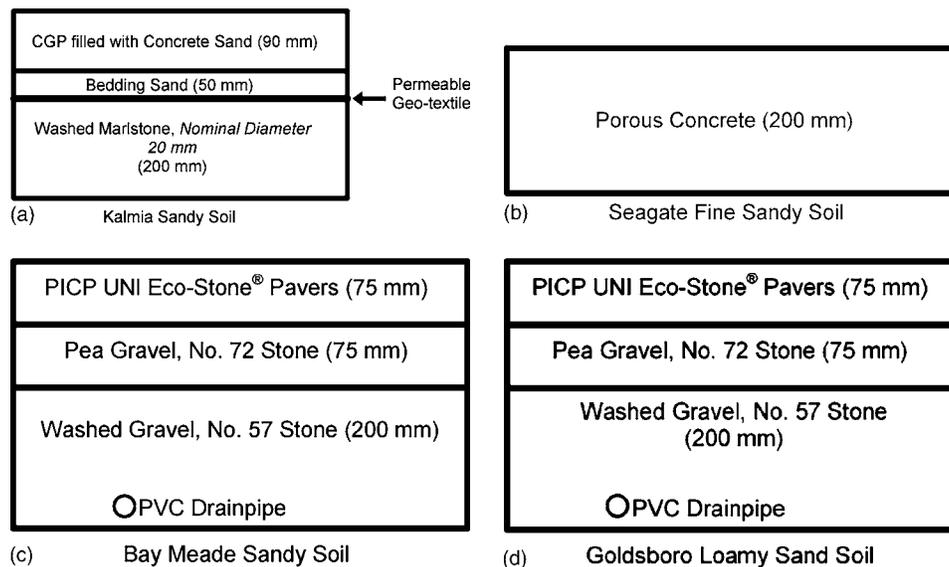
Diagram of permeable pavement cross sections: (a) Kinston CGP site; (b) Wilmington PC site; (c) Swansboro PICP site; and (d) Goldsboro PICP site
